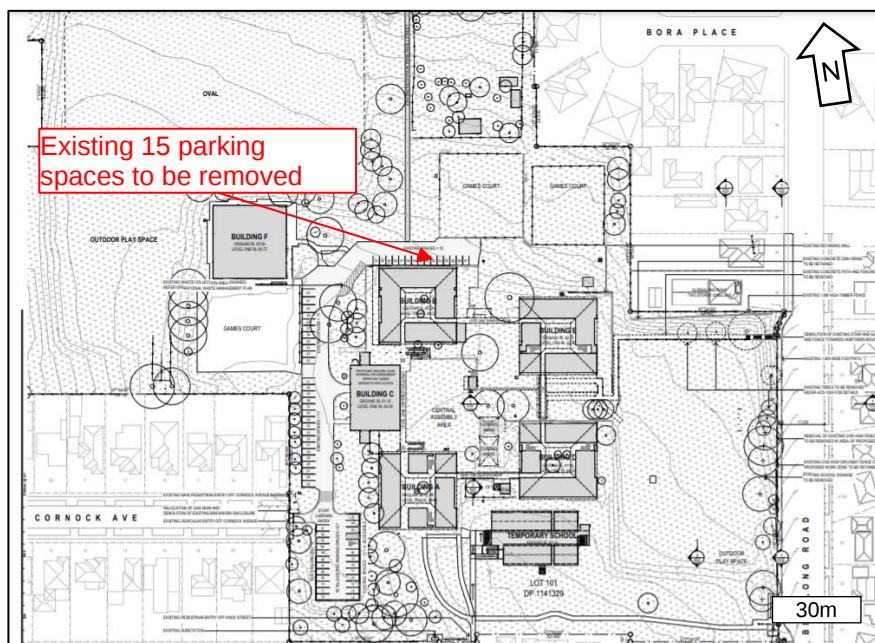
| Existing site plan (Source: Applicant's RtS 2021)
